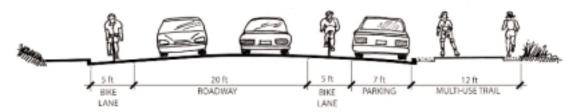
Proposed Development of Bay Area Ridge Trail at Washington Boulevard
